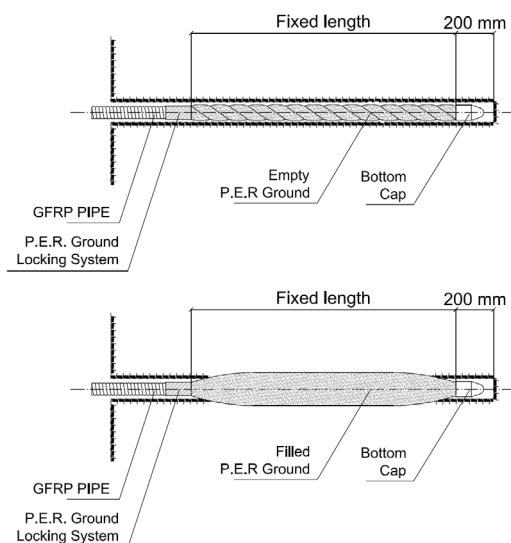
Innovative soil nail for the tunnel face reinforcement (PERGround, Elas Geotecnica S.r.L.)
